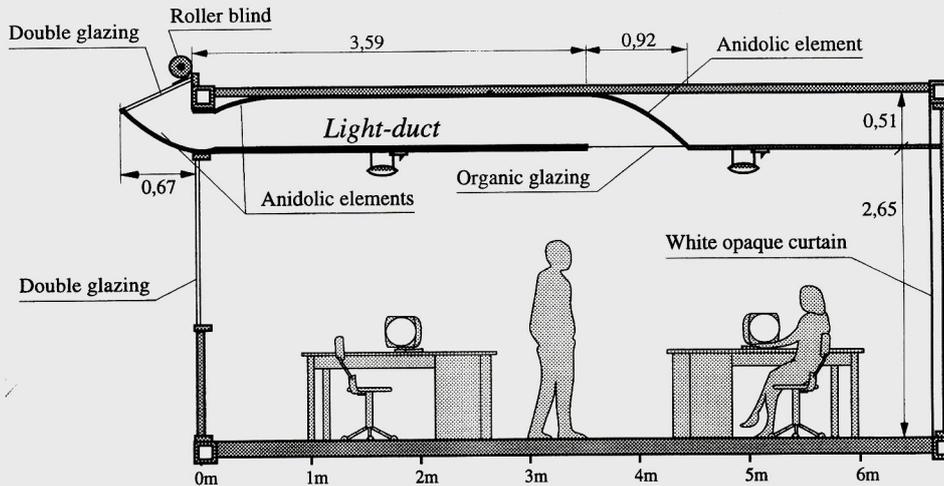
The cross-section of the test room, fitted with an Anidolic Ceiling.
